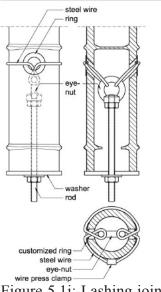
Lashing joint with eye-bolt, Widyowijatnoko
